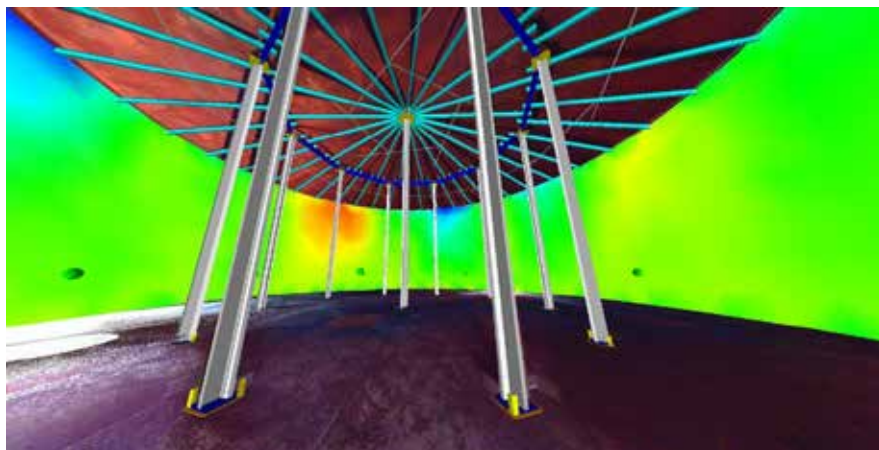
3D model with the layout of the floor, shell, roof, structure, and appurtenances. Source: (TechnoSoft, 2016).
